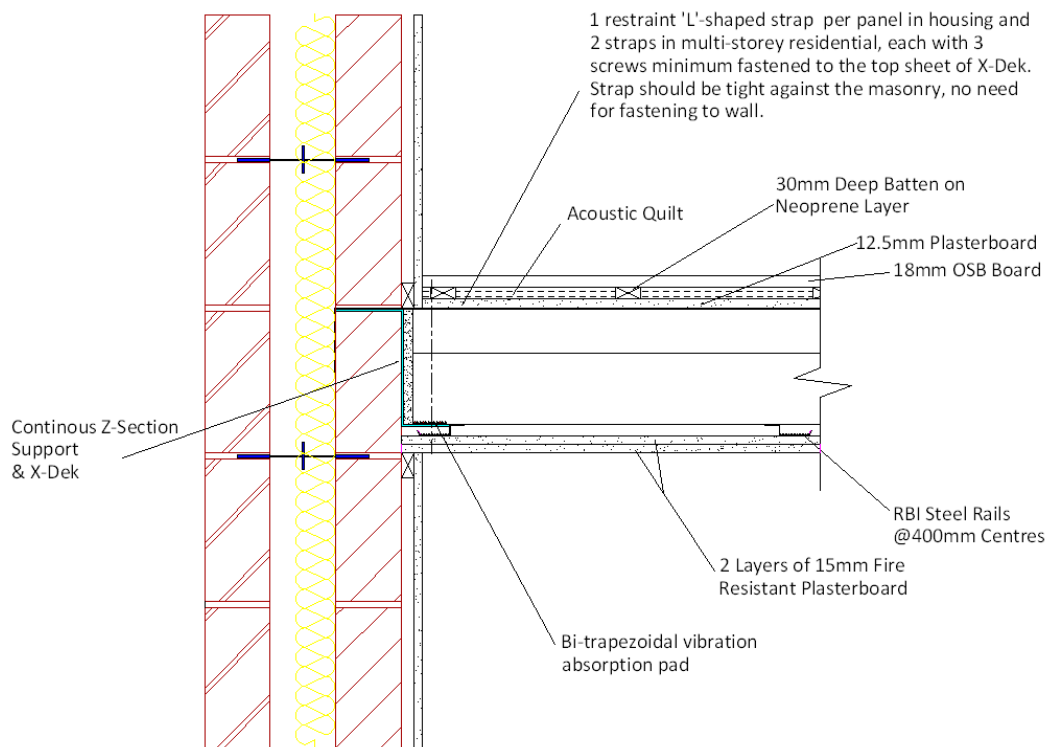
Construction details of *Floor-Dek* separating floor attached to blockwork
